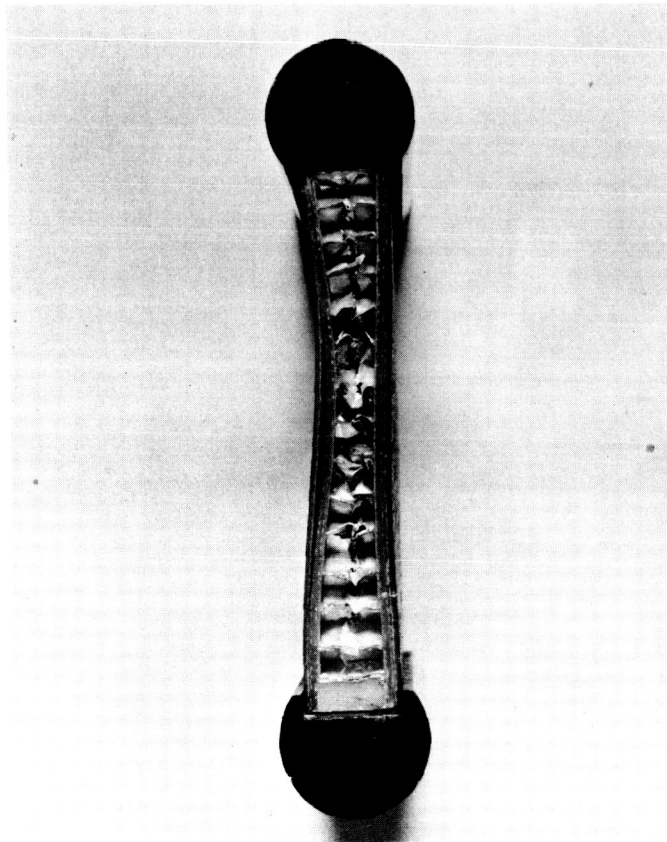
Edge View of Upper Sandwich Panel Test Specimen, with Doublers, following Edgewise Compression Test
